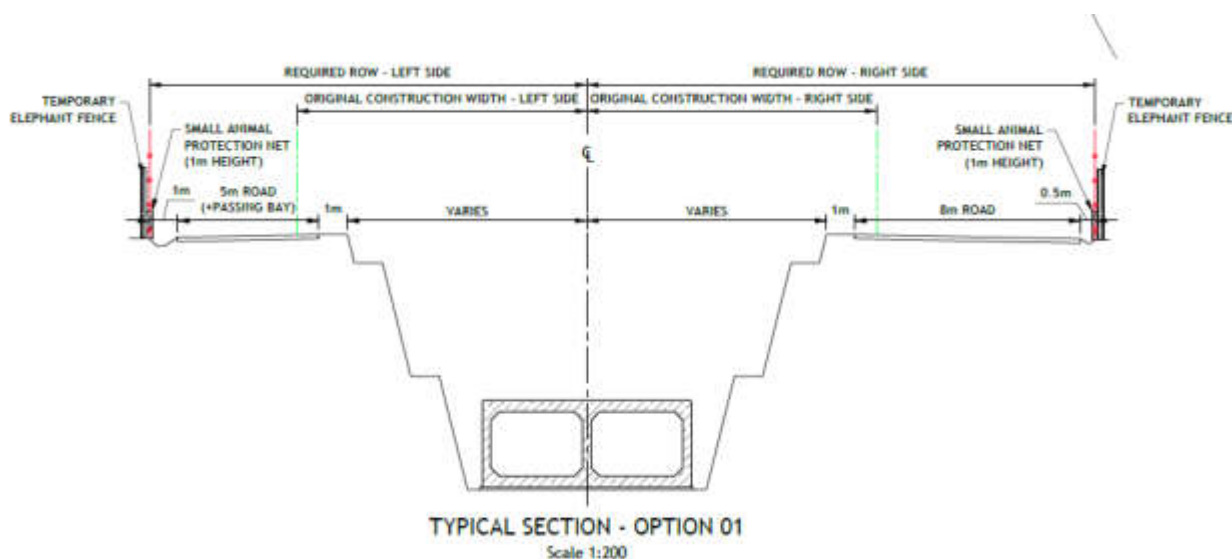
Typical section to install both electric fence and small animal protection net at the edge of approved additional RoW
